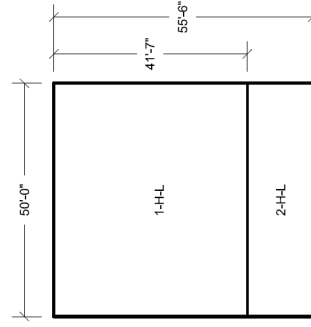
H.6-117: COOLING TOWER WEST WALL LOOKING EAST
